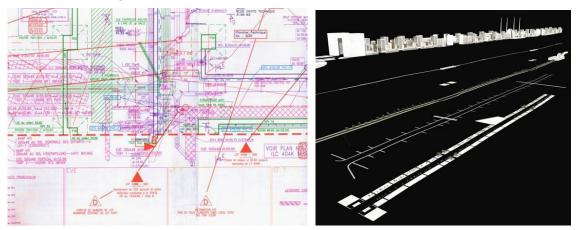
Underground station Magenta (RER E), Paris, Plan de synthèse (left); King Abdul Aziz Road, La Mecque (architects: Architecture Studio) (right)
